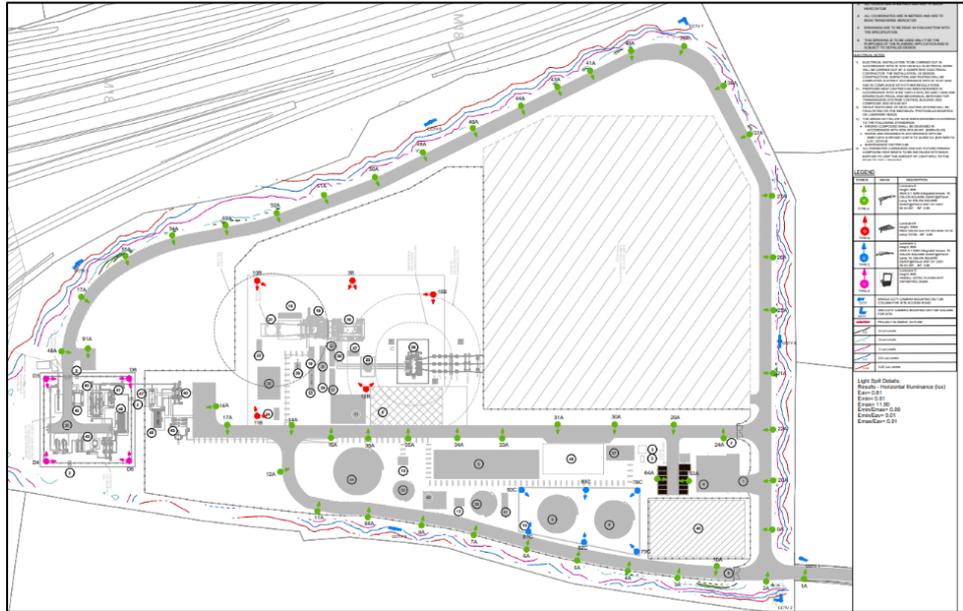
Extract from Site Lighting Layout Plan. Drawing Ref No. PEK3-ATK-ZZ-ZZ-DR-EE-901300 Source: AtkinsRéalis
